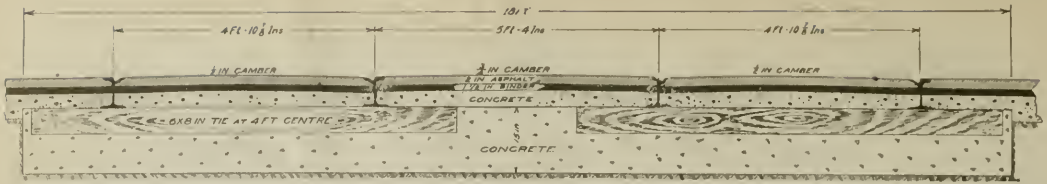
Asphalt Pavement with 7-in. Girder Rail, 1917 Construction
